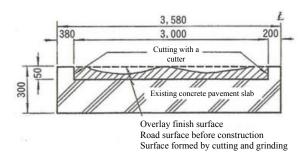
Construction cross-section in tunnel²¹⁾
